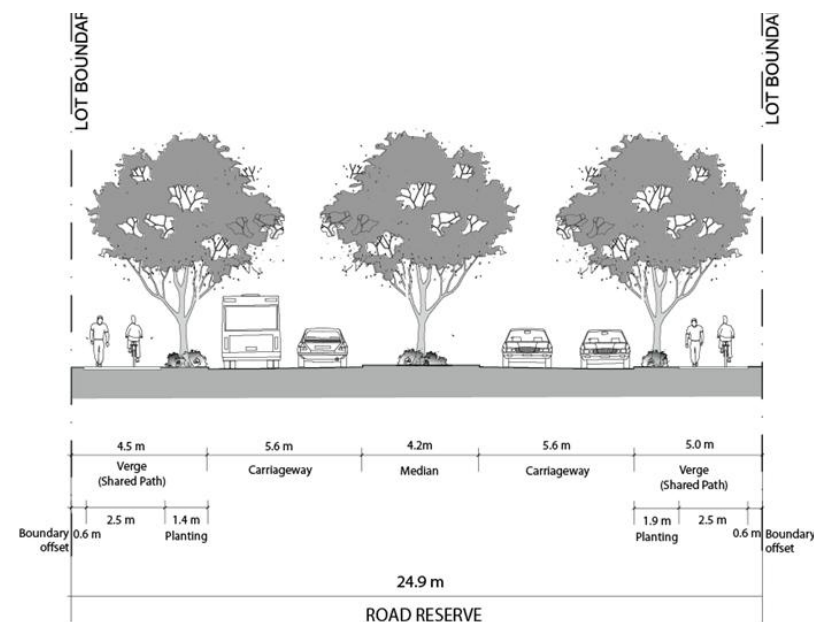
Proposed (4-lane) sub-arterial road cross-section
